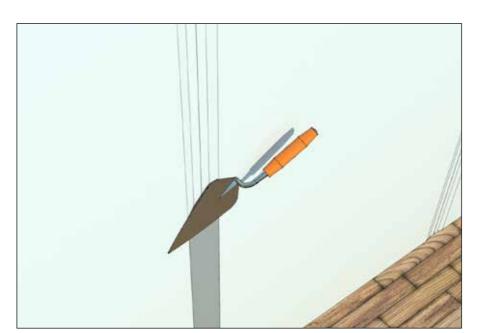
Taping and Filling Joints in Spacetherm Multi
